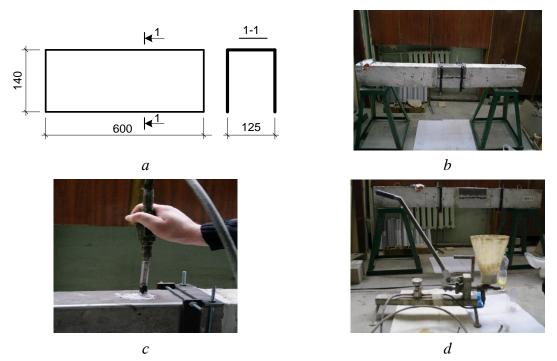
The beam with fixed metallic casing: a – metalic casing; b – general view of the beam with casing in the upper area of the beam; c – packer on the top of the casing; d – general view of the mechanical pump Desoi HP 30-LD
